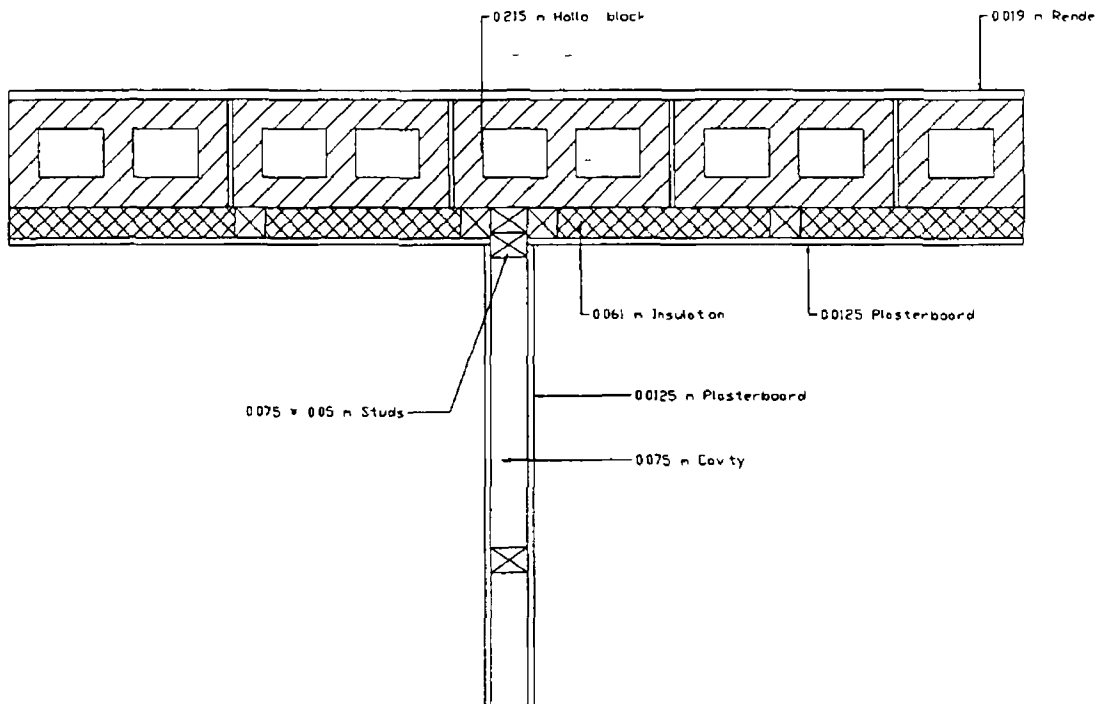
4 1: Semi-Detached House Partition Wall and External Wall
